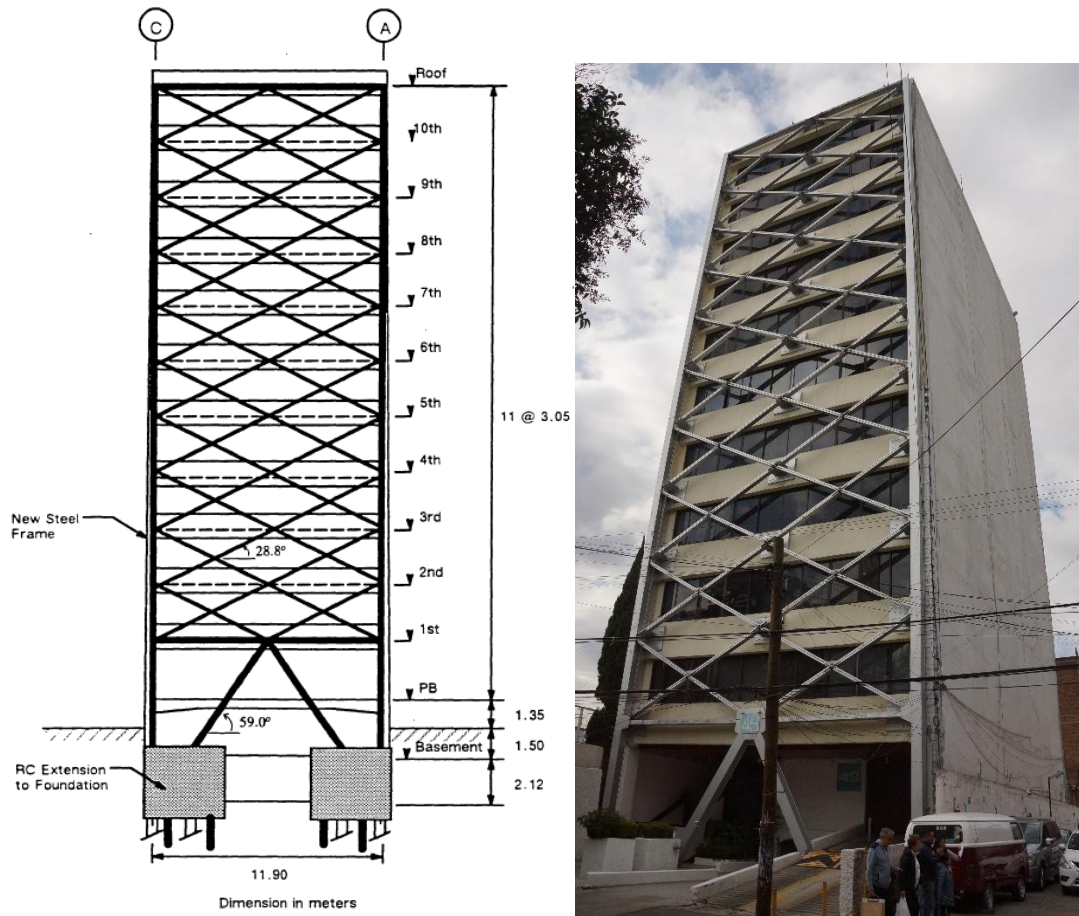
Elevation of Frame 5 after retrofit (Downs, et al., 1991) alongside a view of the southeast corner of the building
